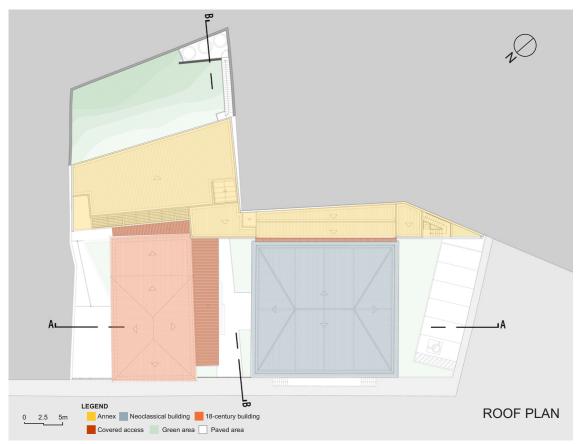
Roof plan by A+P Arquitetos Associados [Source: ArchDaily.]
